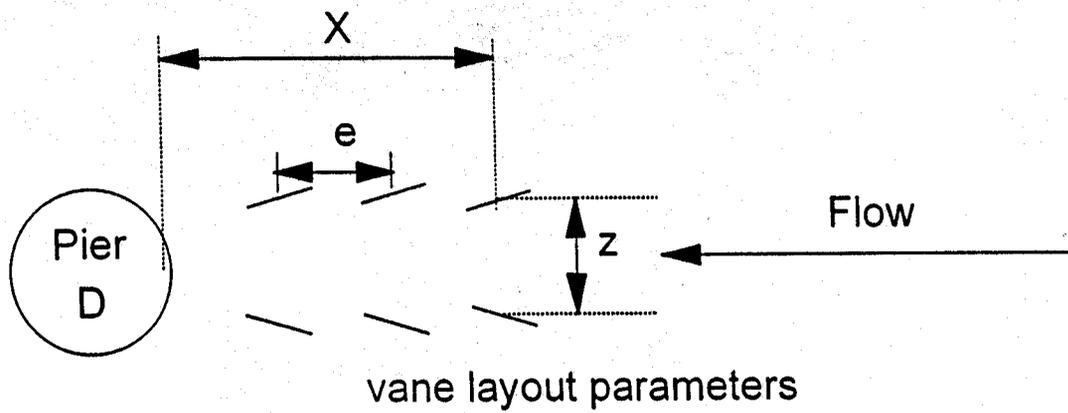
Submerged vanes for pier scour reduction (after Lauchlan, 1999).
